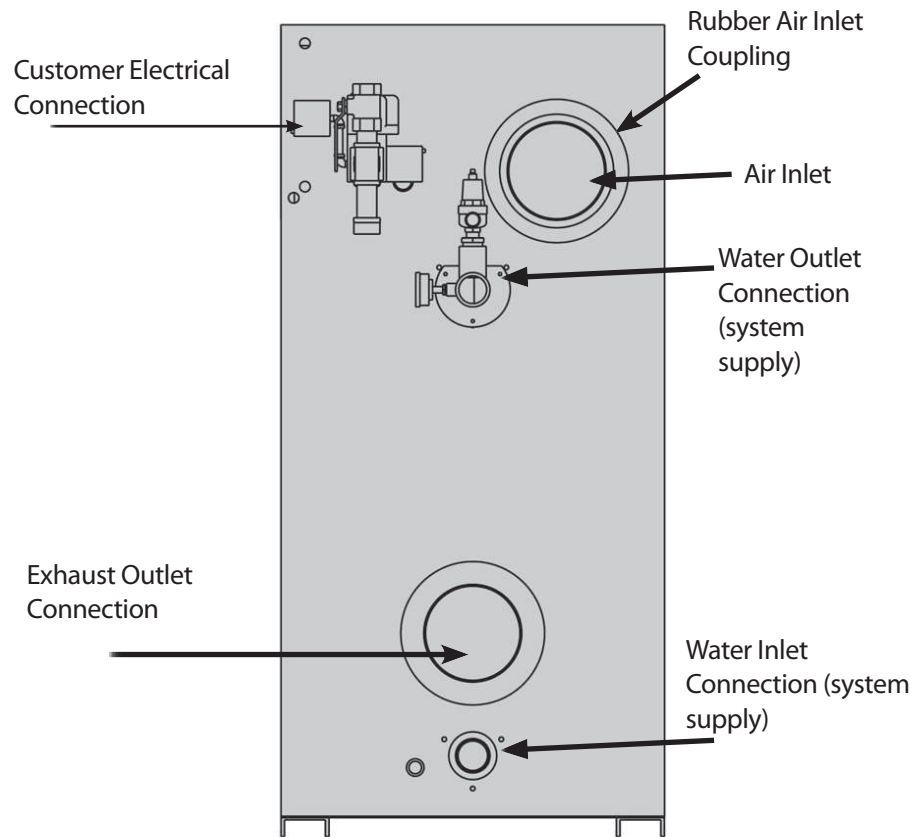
WATER INLET AND OUTLET CONNECTIONS
